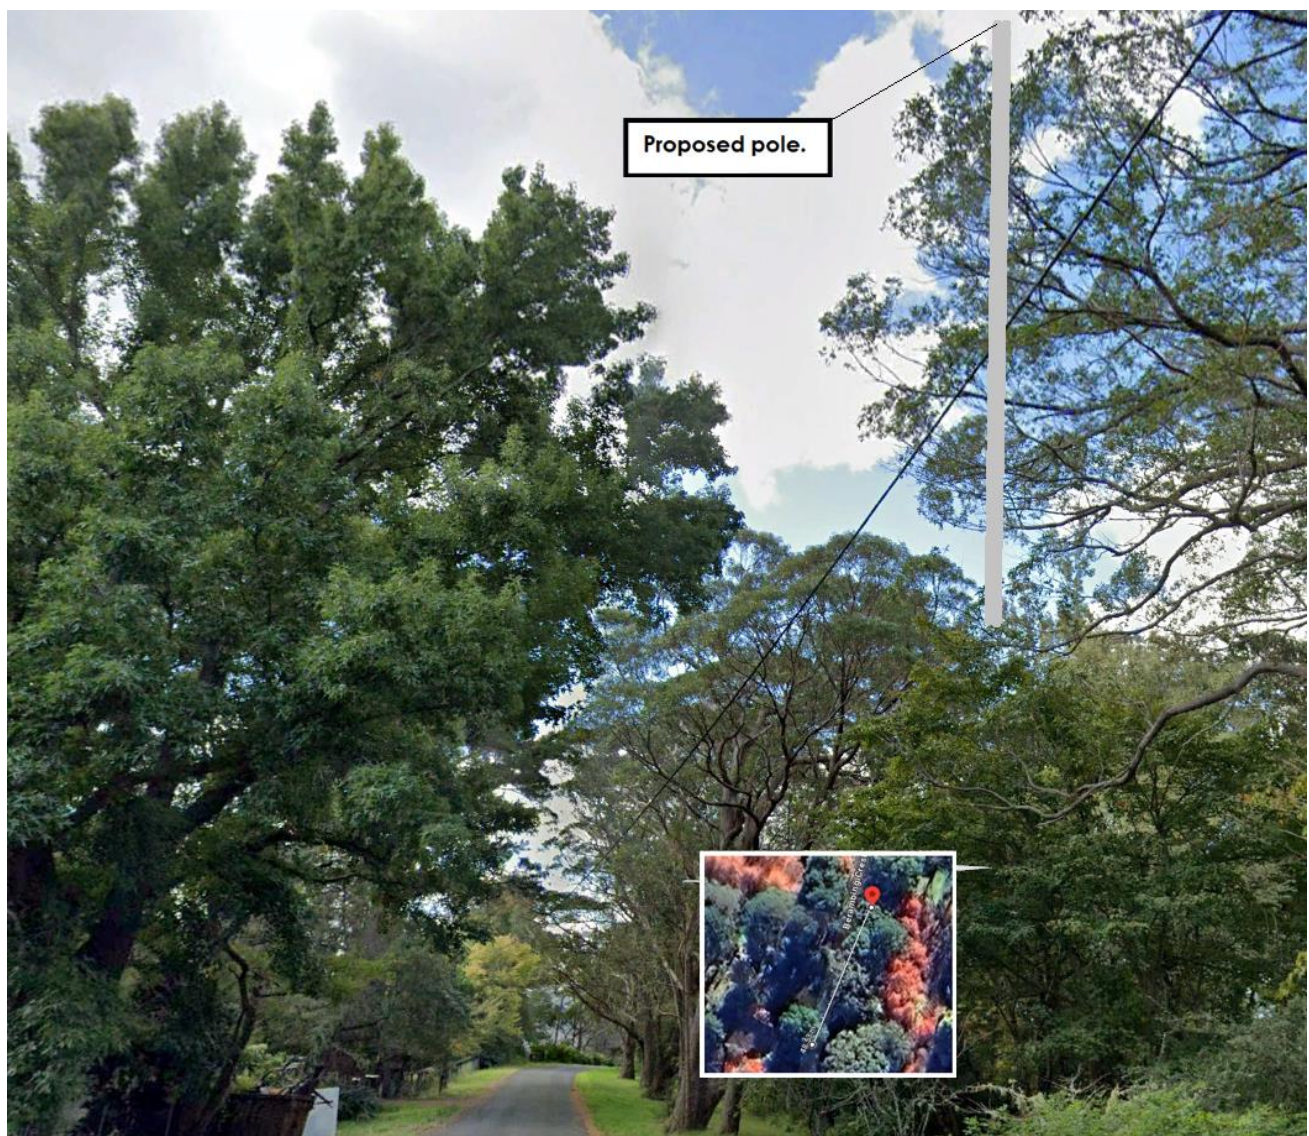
View 48.53m south facing north towards the proposed site on Berambing Crest. Source: Google street view, n.d.
